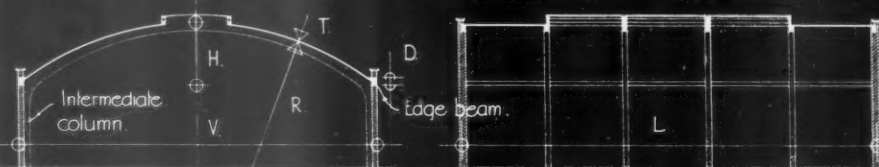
SECTIONS OF BEAM &amp; COLUMN TYPE.
